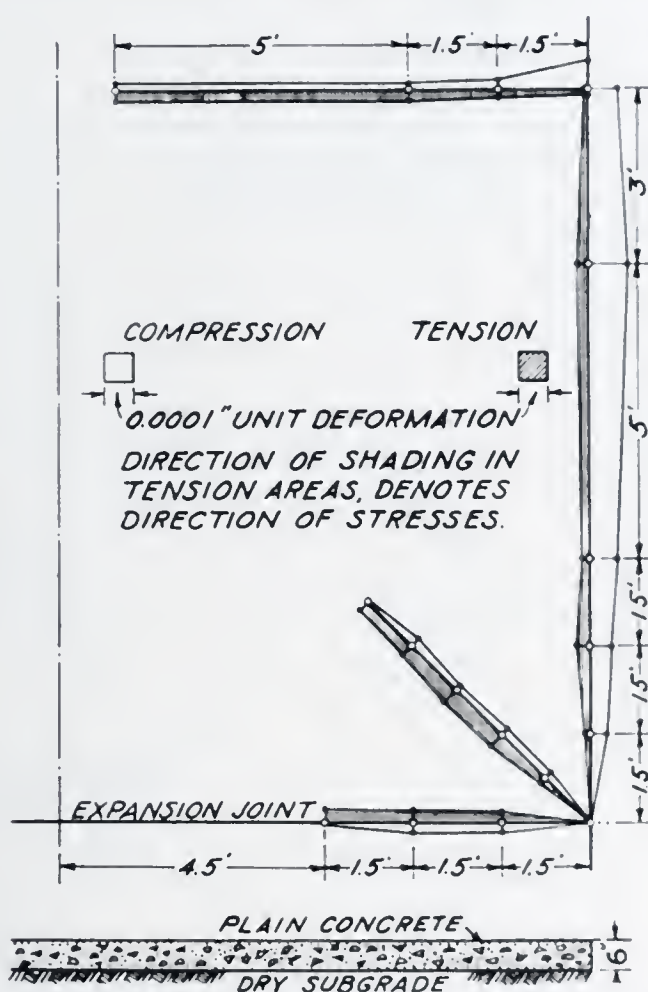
Maximum Deformations in Top of Concrete Pavement Under Traffic.
